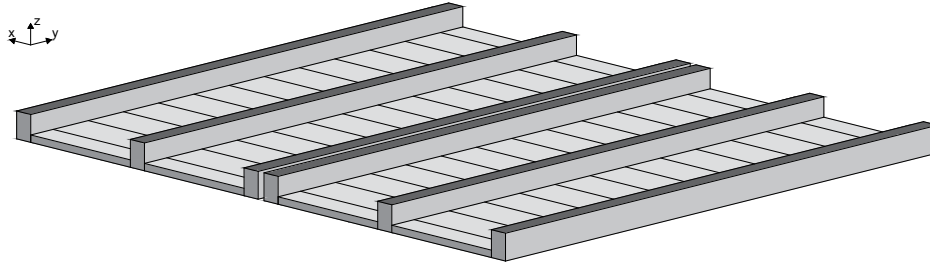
Indication of a trough bridge structure with width reduction through extra side girders
